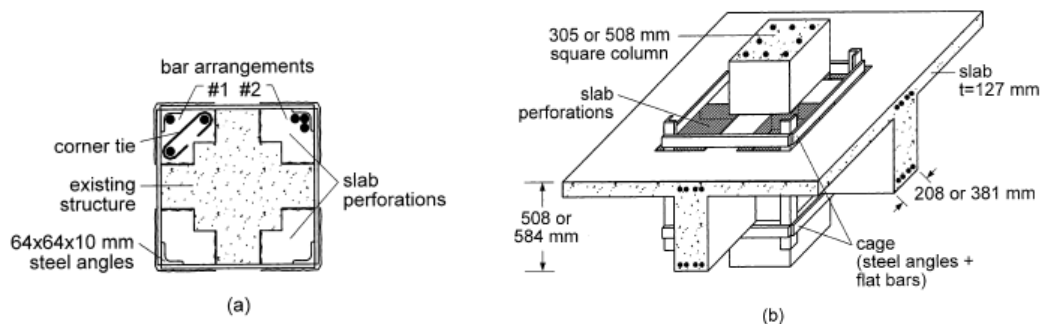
Concrete jacketing technique studied by Alcocer and Jirsa. (a) plan, and (b) perspective
